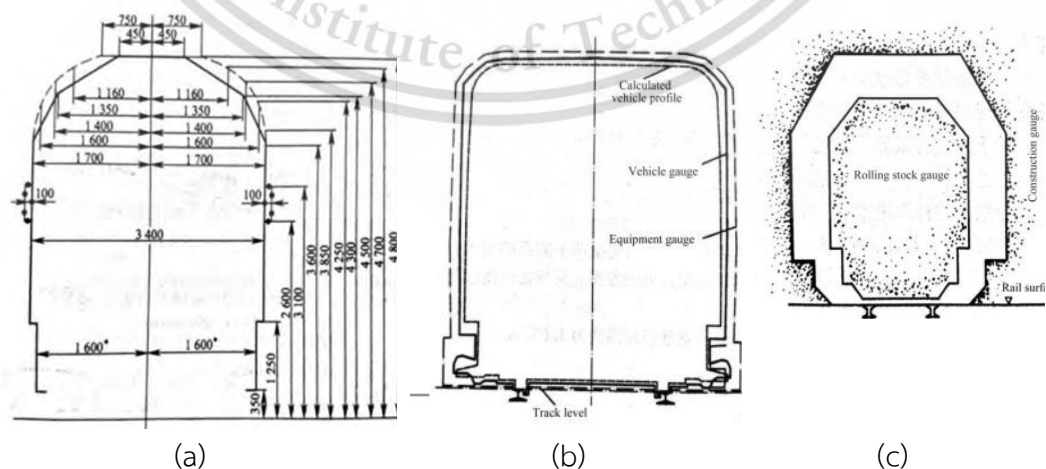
Railway clearance (a) Vehicle gauge (b) Equipment gauge (c) Construction gauge
